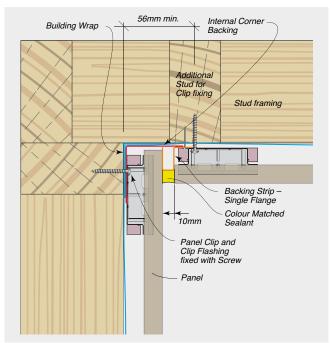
External Corner Detail – With Coloured External Corner Trim – Plan View
